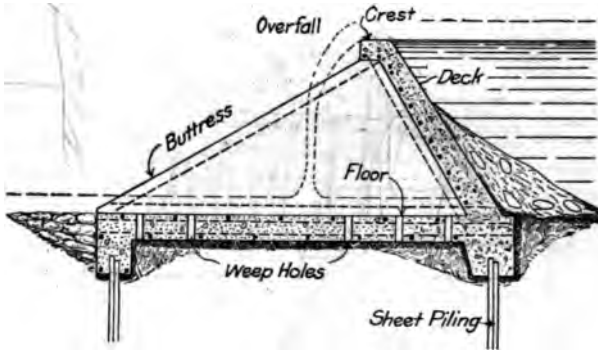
Open Front Dam with Floor and Buttresses for Alluvial Streams.
